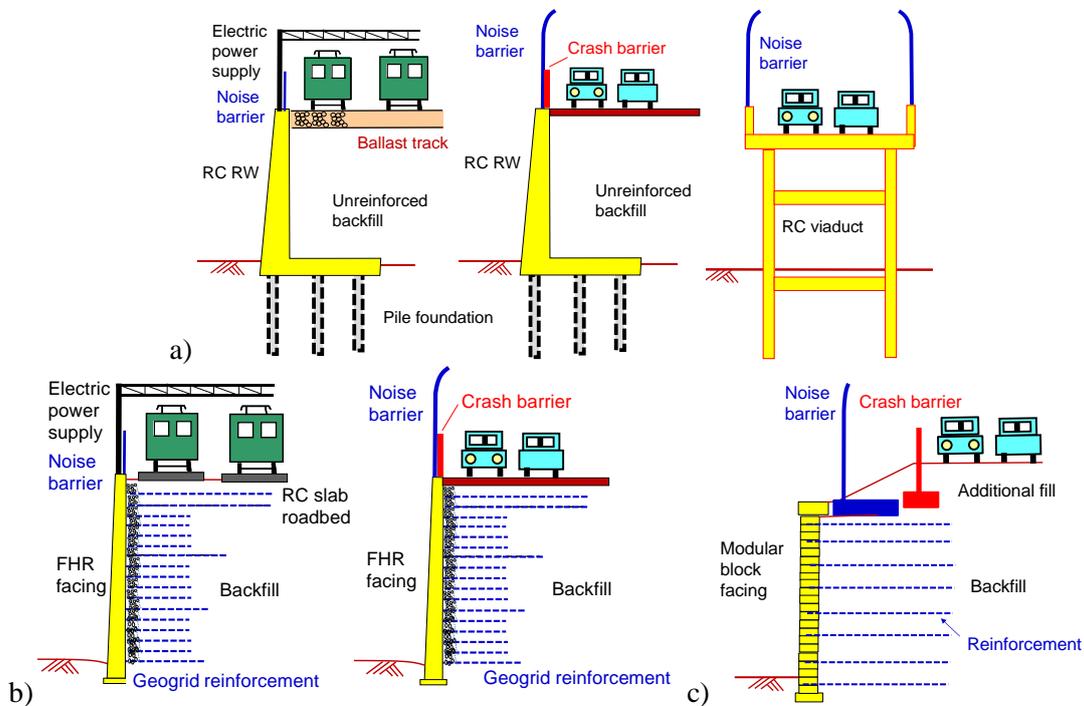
Typical elevated structures: a) conventional (piled cantilever RC RW & RC viaduct); b) GRS RW with FHR facing; and c) reinforced soil RW with modular block facing.
